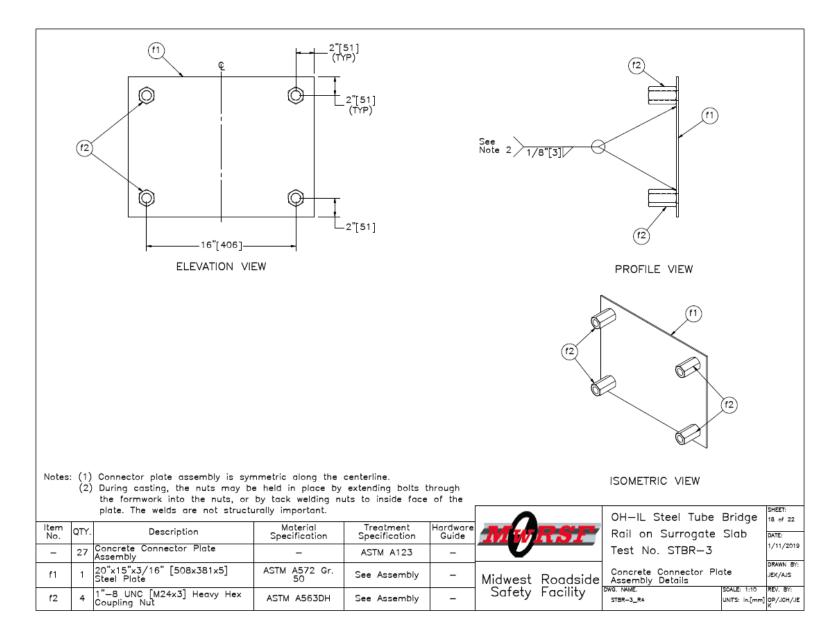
Concrete Connector Plate Assembly Details, Test No. STBR-3
